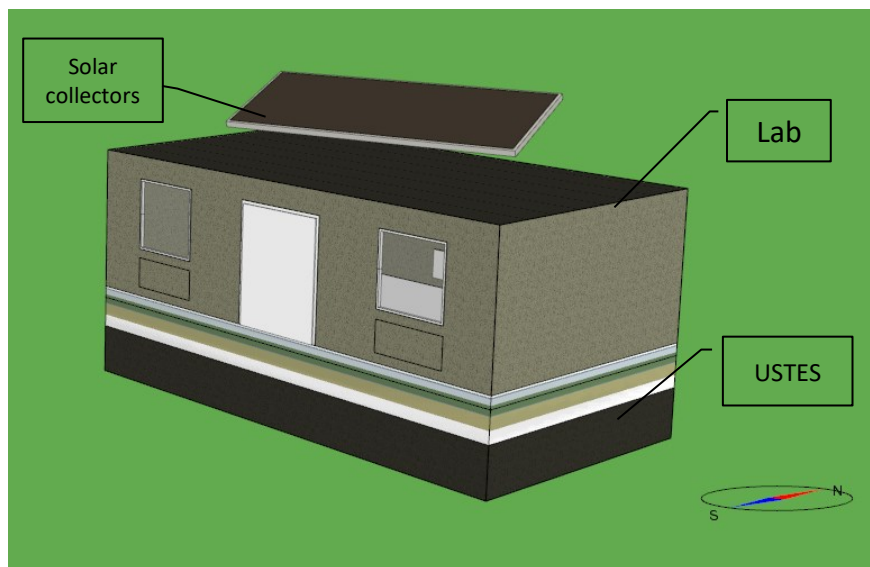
The 3D model of the lab building with USTES underneath and solar collectors on the roof
